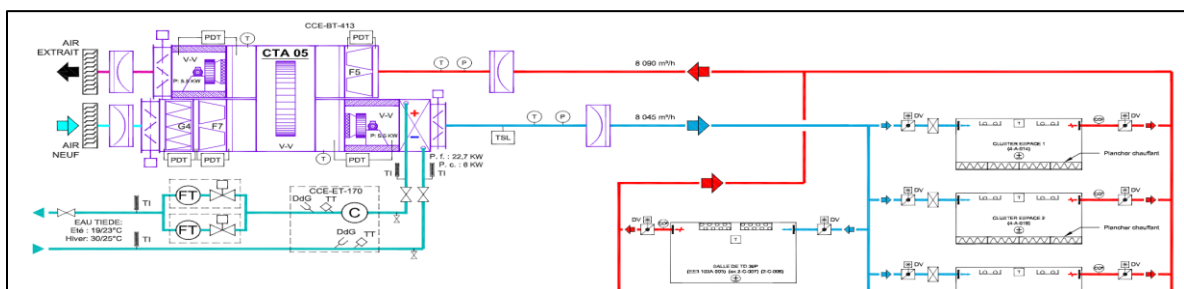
The Air Handling Unit (CTA 05) layout and its connection to the rooms in the living lab zone.
